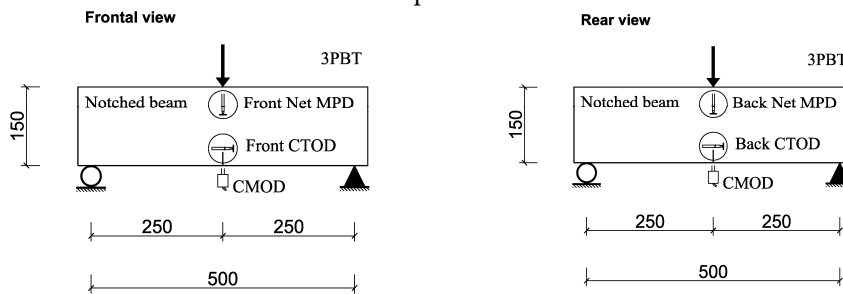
Three bending test set-up: a) front view; b) back view (dimension in mm).
